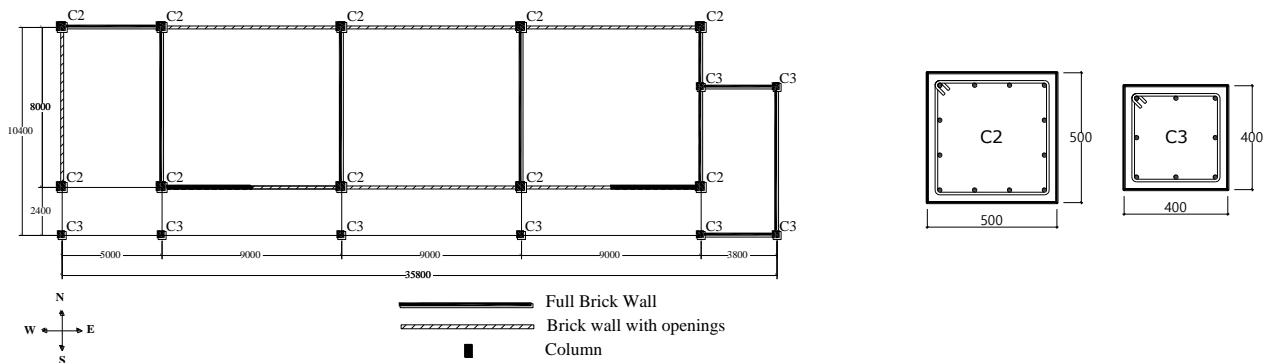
Floor plan first story of Faculty of Forestry building of Tadulako University
